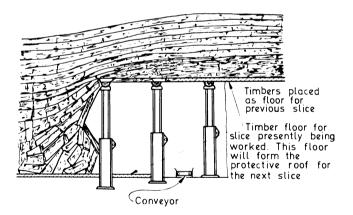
Top slicing in a thick seam using yielding props for support.⁽¹⁾
